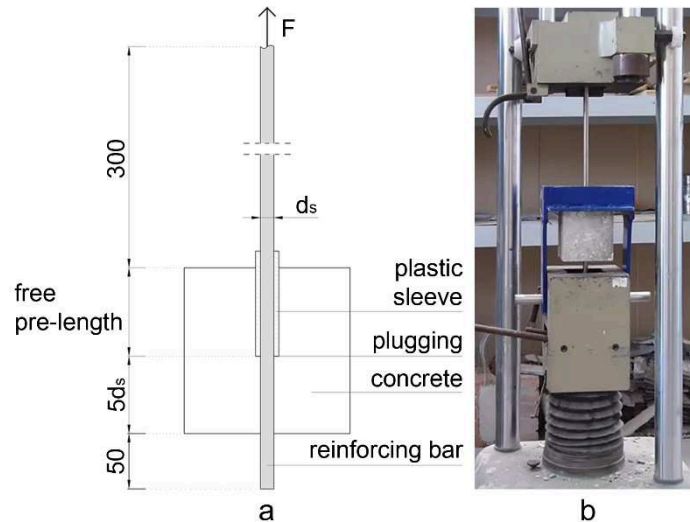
a) Pull-out scheme; b) Pull-out test set-up
